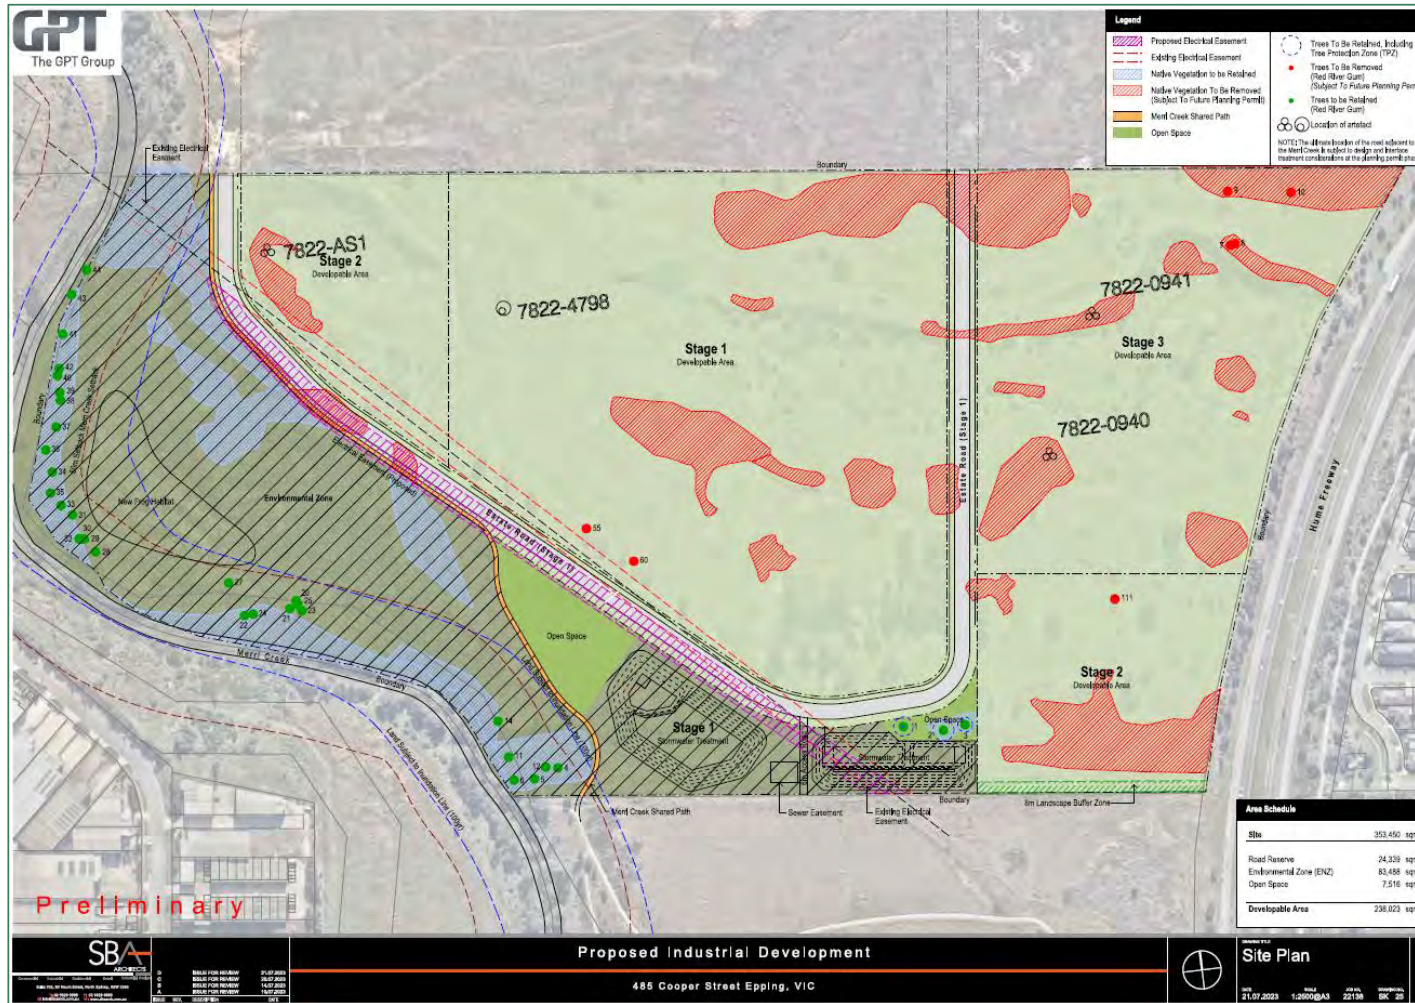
DEVELOPMENT PLAN LAYOUT
